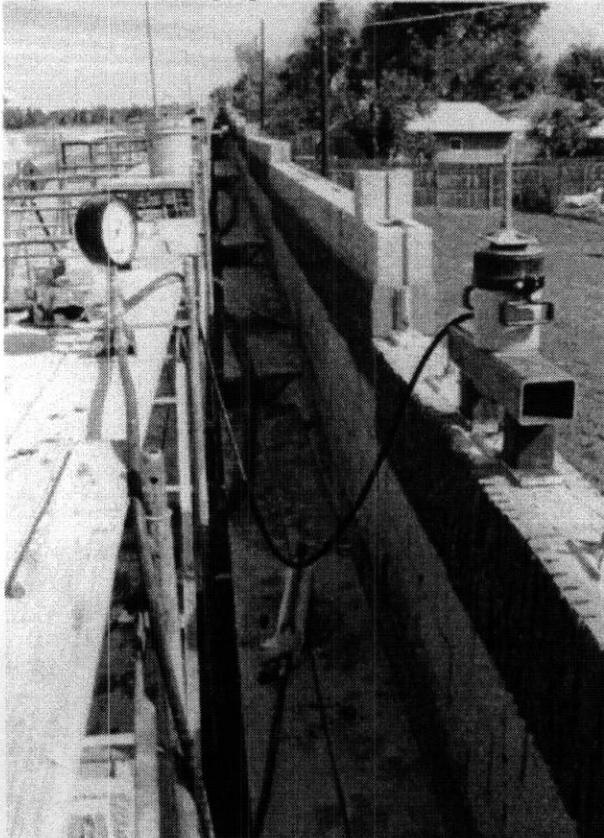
A hand hydraulic pump was used with a hydraulic ram to accurately tension the instrumented and intermediate tendons.
